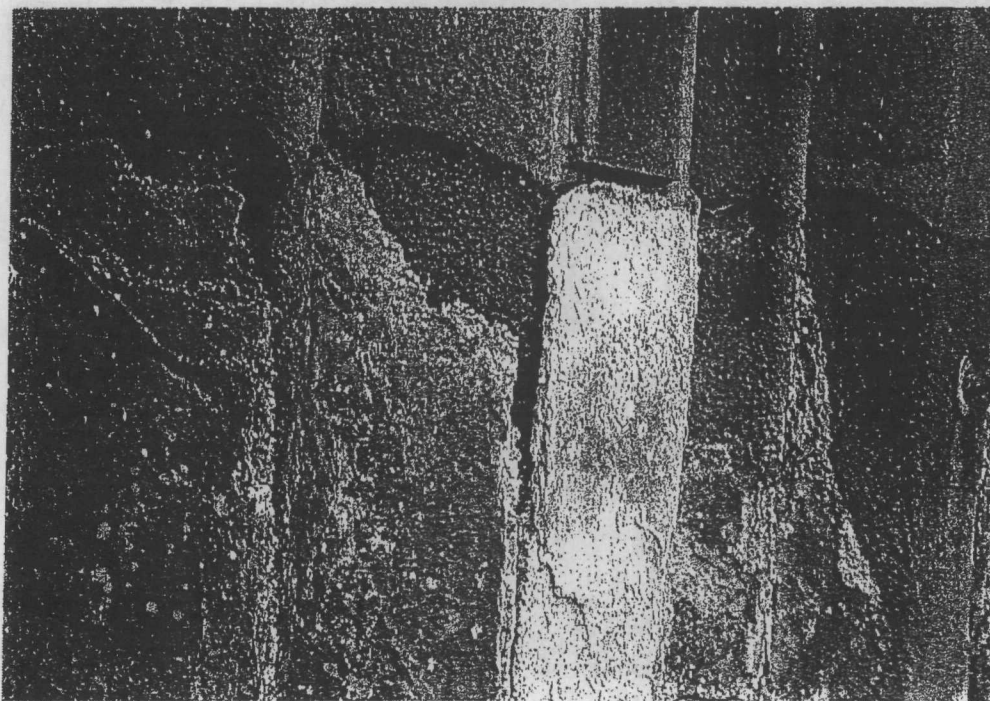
View of Typical Steel Condition at Station 9+40, Looking South. Note Heavy Layer of Pack Rust and Steel Section Loss from the Waterline up 2 Feet.
